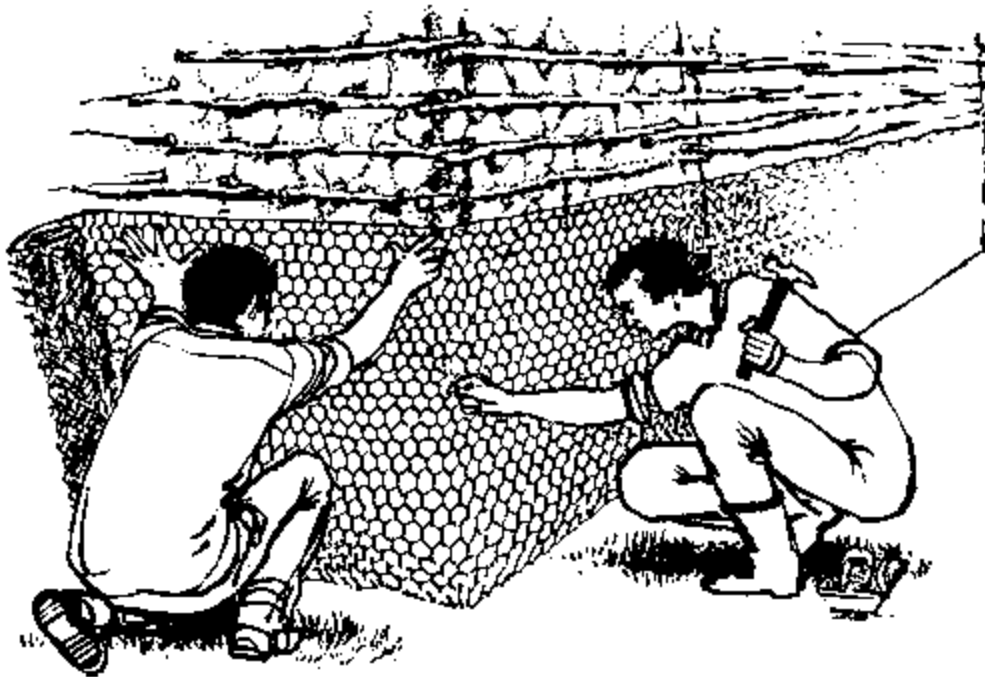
Cement plaster can be reinforced with wire netting.
